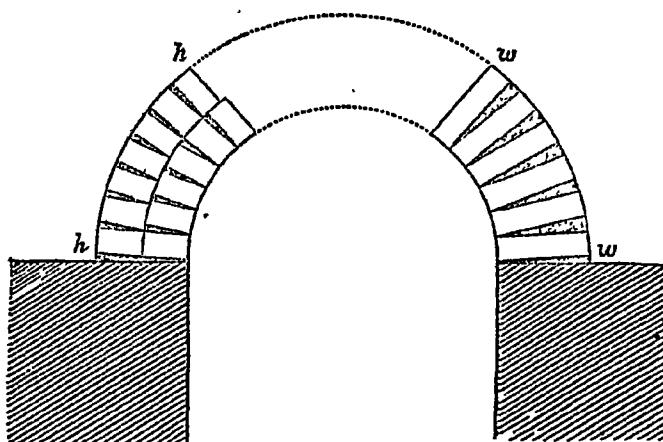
shows the elevation of a rough brick arch turned in rings half a brick (h, h), and one brick (w, w) thick. The shaded portions of the arch are mortar joints. Scale = $\frac{1}{10}$. (Building Construction.)
